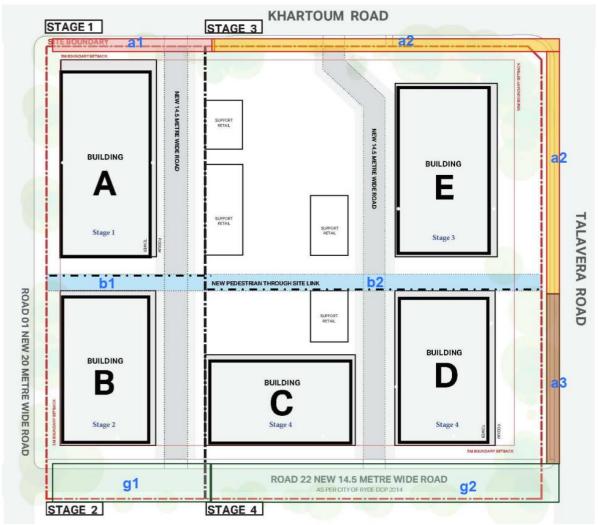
Extract from Staging Plan exhibited with the draft planning agreement (source: 3XN)
